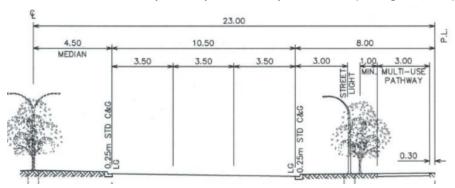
Standard Cross Section for Six-Lane Arterial Street with Multi-Use Pathway
